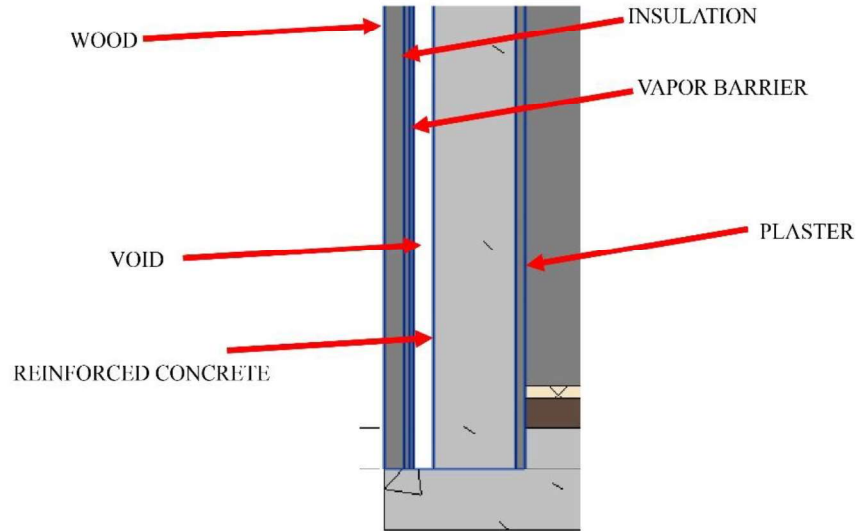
Wall section showing construction materials. Source: Revit Autodesk 2020 by Author
